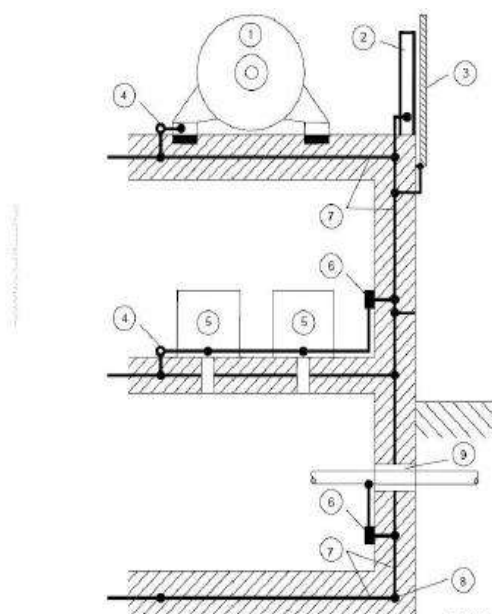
Equipotential bonding in a structure with a steel reinforcement
